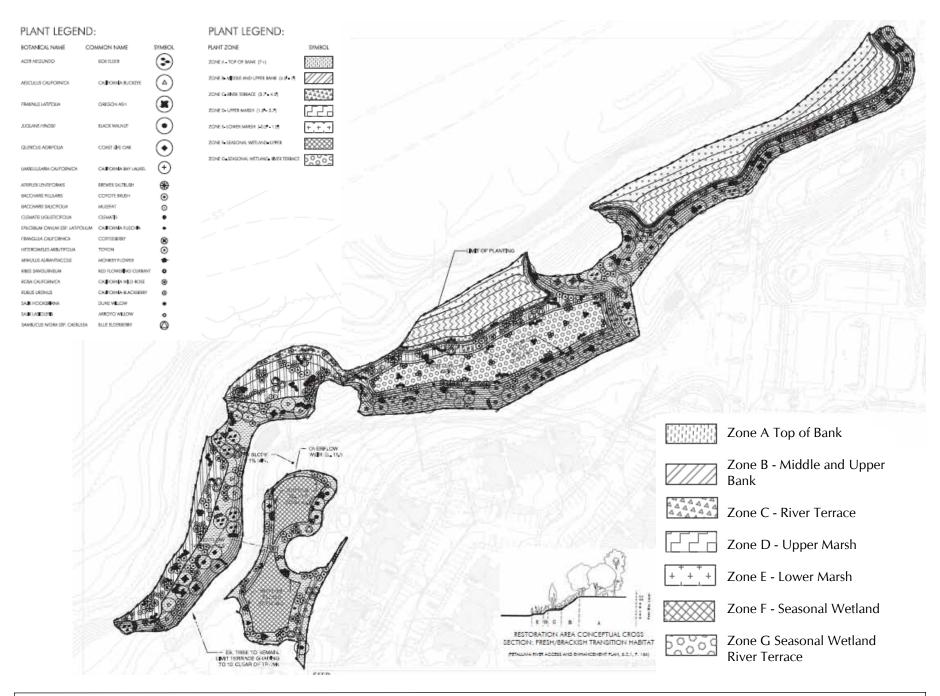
Proposed Petaluma River Terrace, Conceptual Re-Planting Plan
